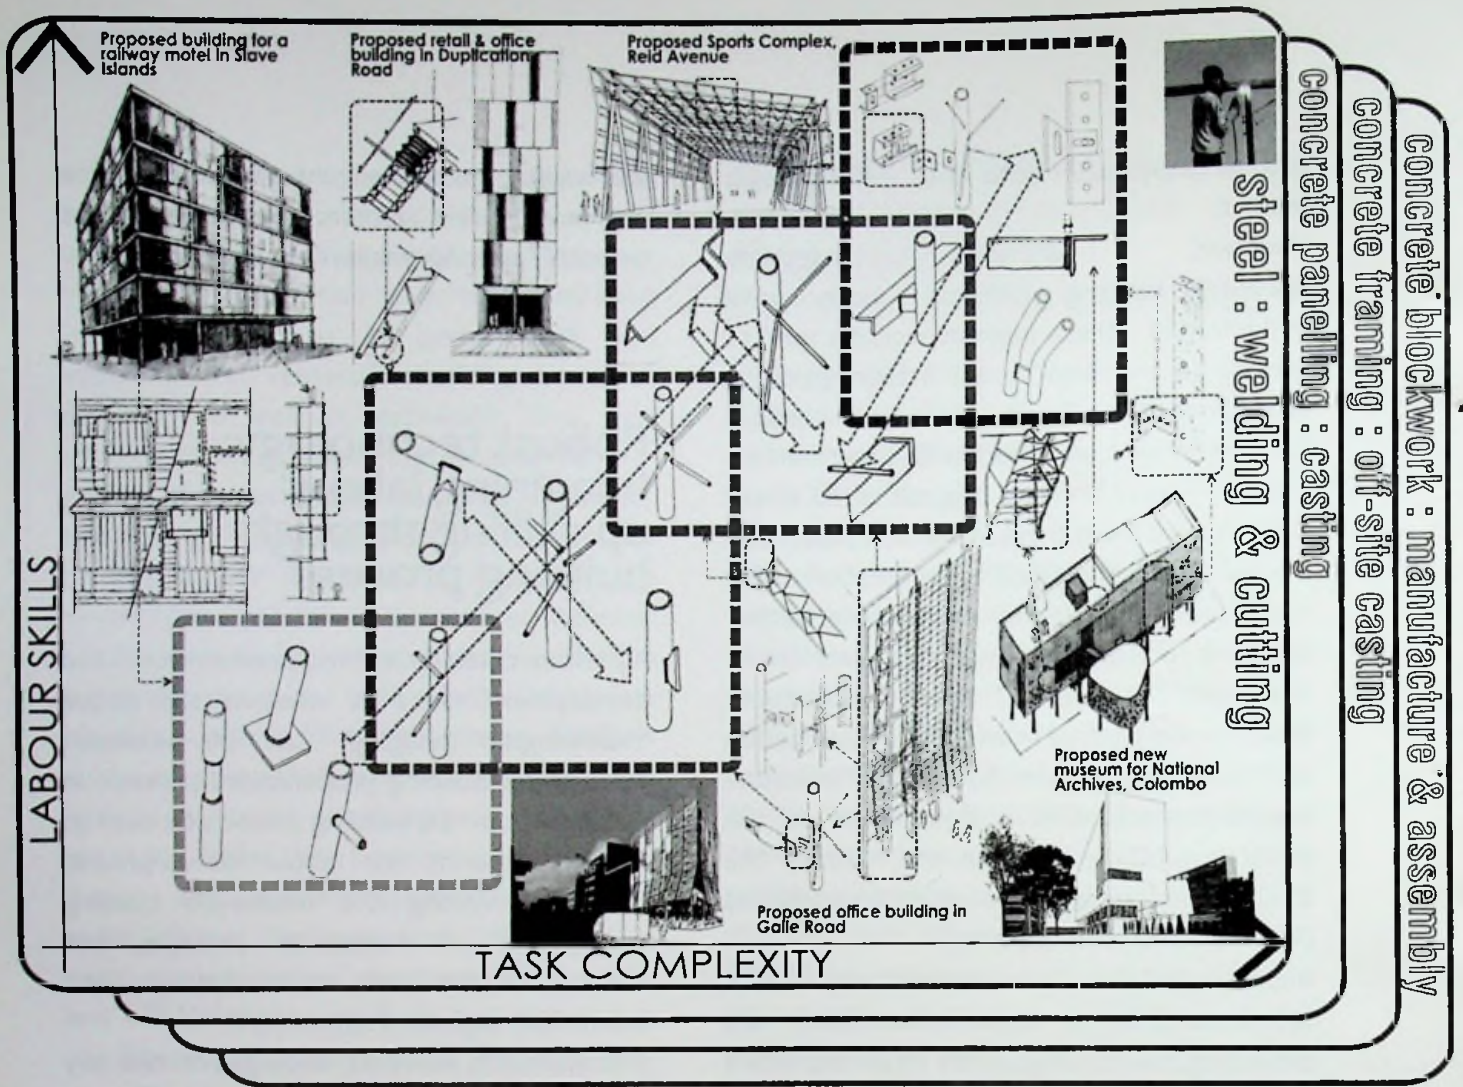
Cross-industrial labour up-skilling strategy for steel welding and cutting skills
